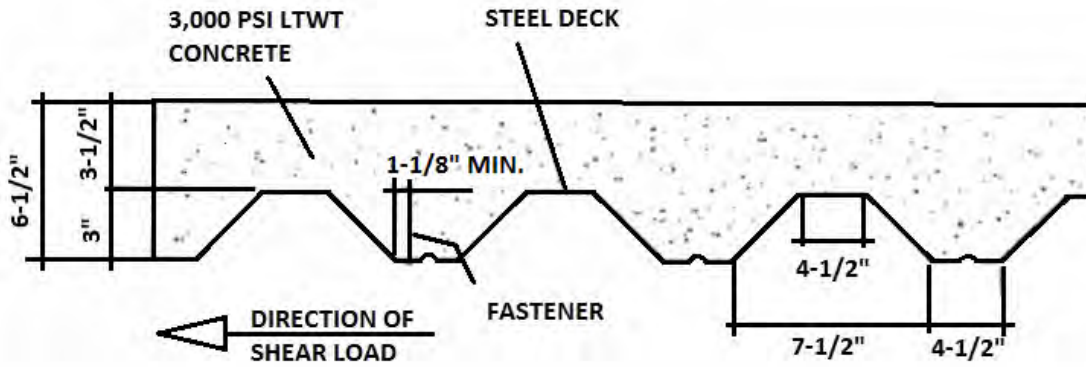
INSTALLATION THROUGH STEEL DECK PANELS INTO SAND-LIGHTWEIGHT CONCRETE
